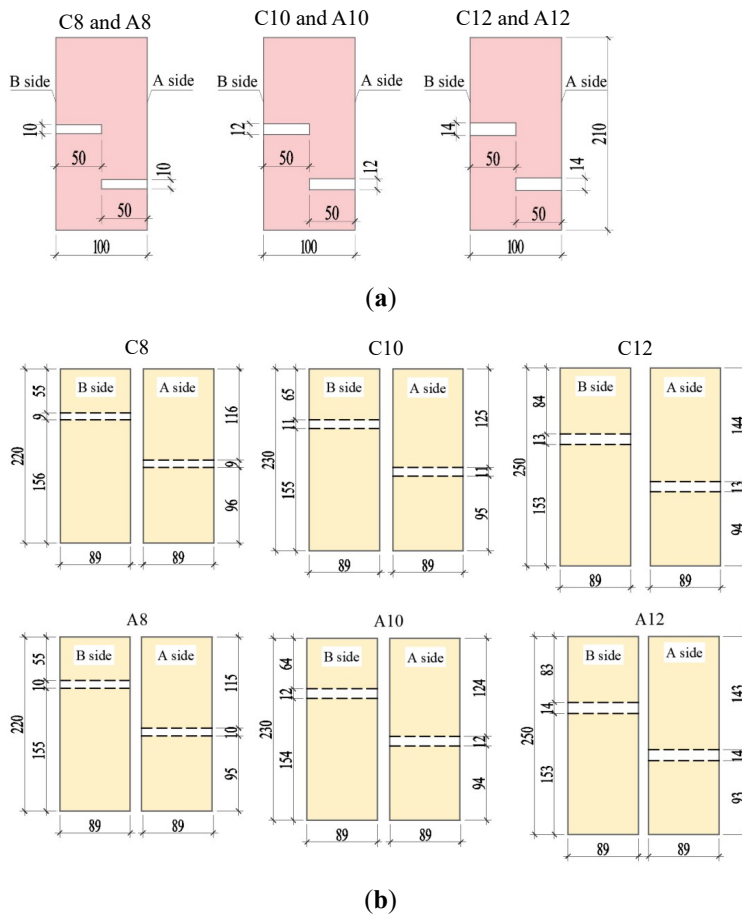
Dimension and bolt position. (a) Brick; (b) SPF lumber.
